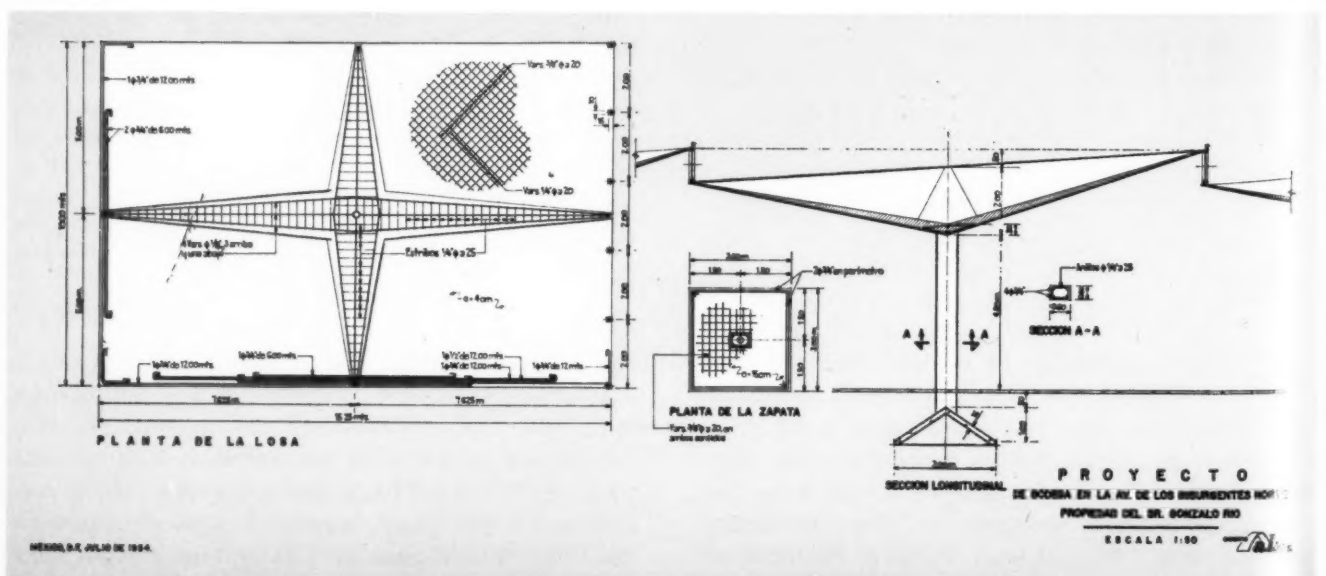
AT LEFT IS SHOWN ARRANGEMENT OF REINFORCING STEEL, AT THE CENTER IS A PLAN DRAWING OF THE COLUMN FOOTINGS. AT RIGHT IS AN ELEVATION DRAWING OF A COLUMN AND A ROOF SECTION, SHOWING ROOF TILT.
